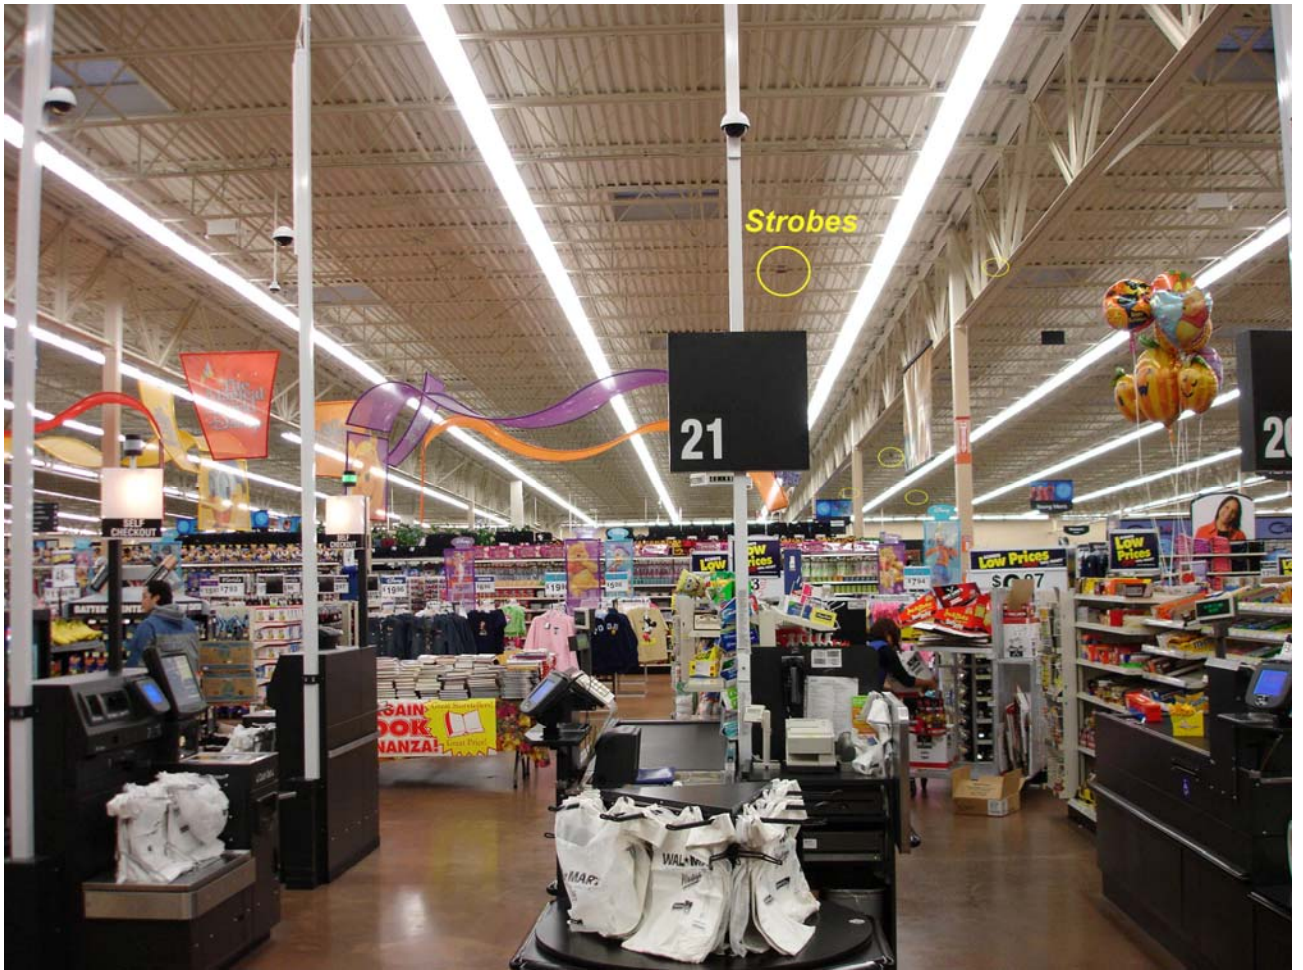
Strobes Located on Bottoms of Bar Joists (Kissimmee, FL)
